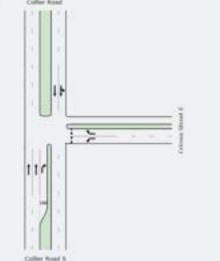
Collier Road / Crimea Street - Existing Geometry
